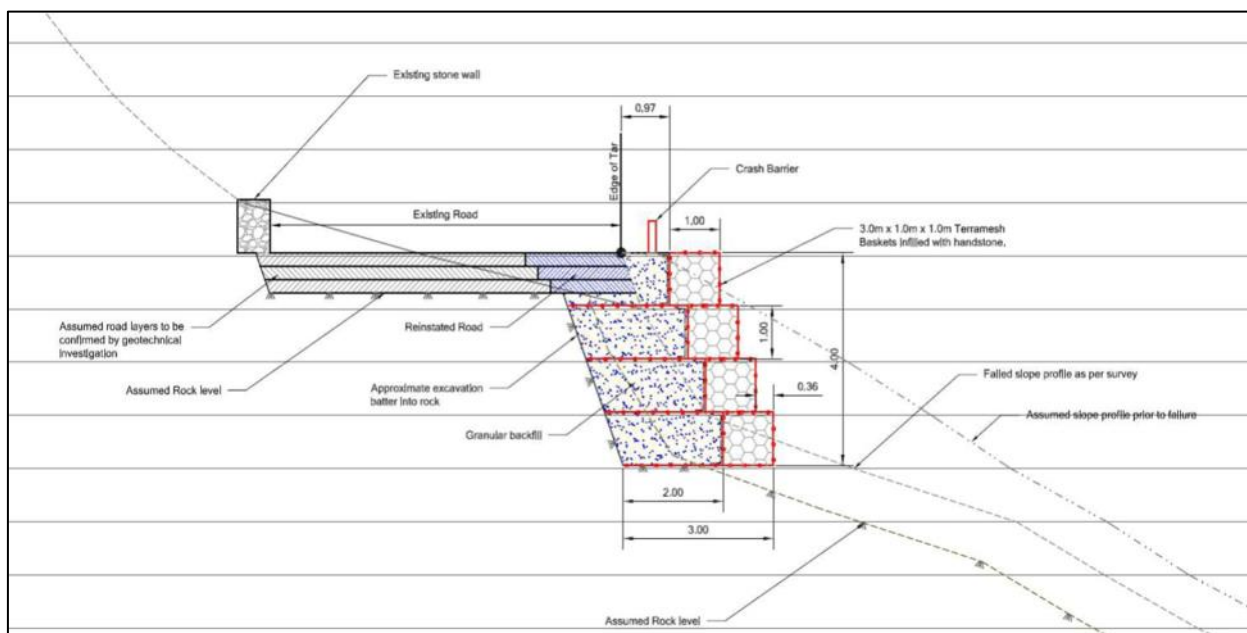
Terramesh retaining wall concept (Ingerop, 2024)
